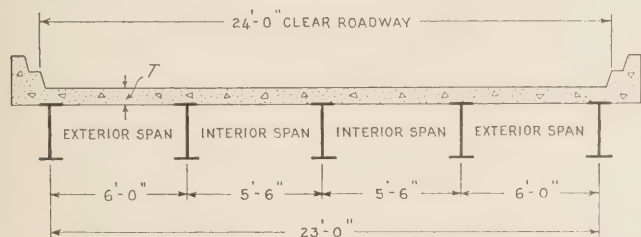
BRIDGE SPAN AND SPACING OF STRINGERS ASSUMED FOR EXAMPLE 1.
